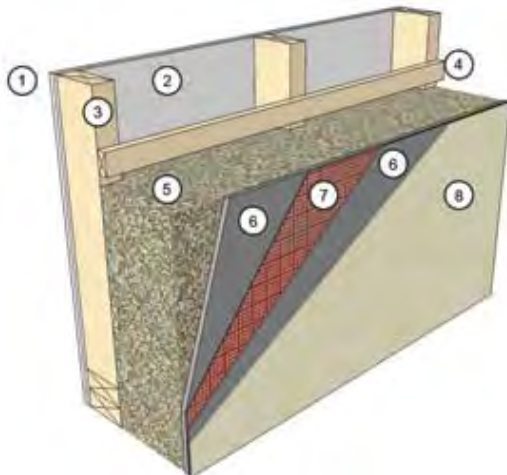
Example Wall System Detail with Hempcrete Rigid Insulation. Components include the following: 1) Plast skim; 2) Board that includes lime; 3) Wood studs; 4) Horizontal batten to tie hempcrete insulation to studs; 5) Hempcrete insulation; 6) Basecoat render; 7) Mesh for basecoat; and 8) Top coat render. (Courtesy of American Lime Technology
